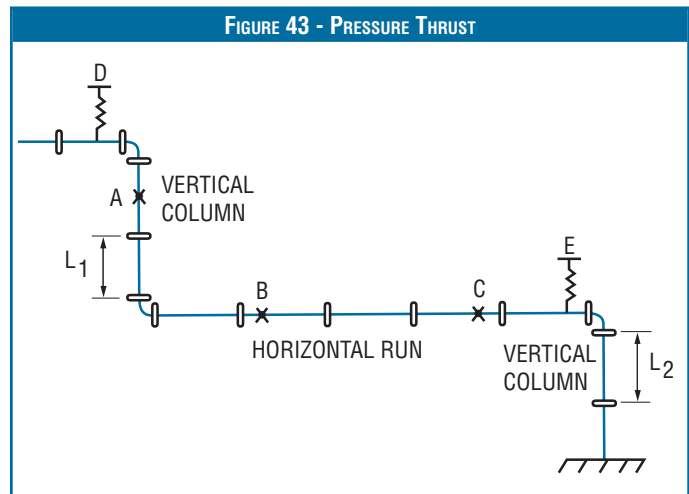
Anchor at “A” to support weight of vertical water column. Use spring hanger at “D” and “E” to allow movement of vertical piping.
